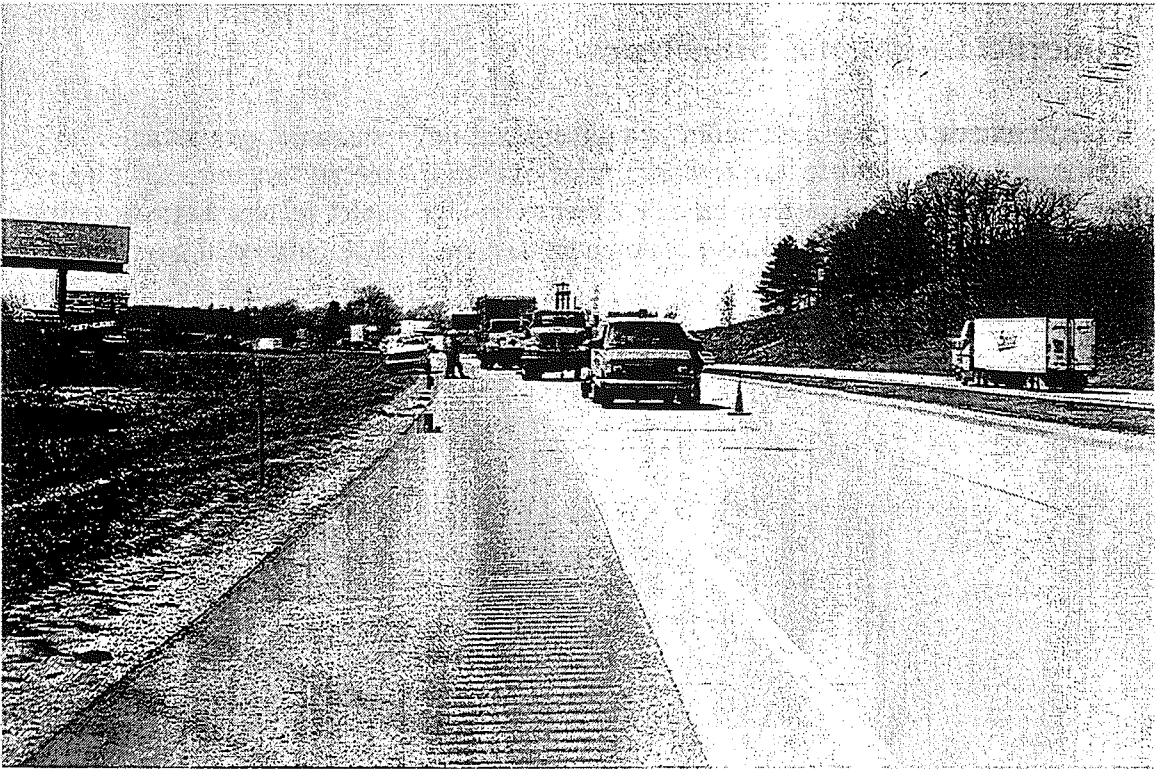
An overview of CSN# 11017-32516A (Section A), EB looking west. The 14 ft widened truck lane design and asphalt shoulder can be seen.
